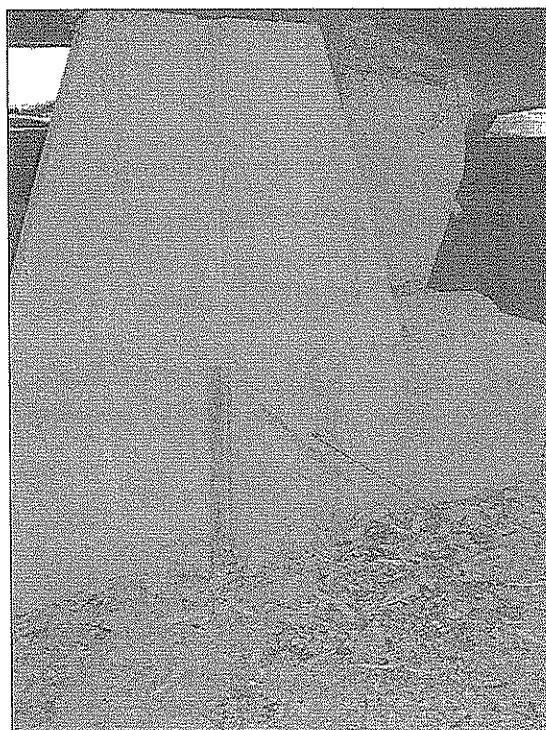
A 2002 photograph of concrete-lined head race Feature 6 and turnout gate Subfeature 6.01 groove on the east wall prior to its partial dismantling, Hayden Ditch site (AZ U:9:189[ASM]) (photograph courtesy of Michael Wilson Kelly - Architects, 2002).
